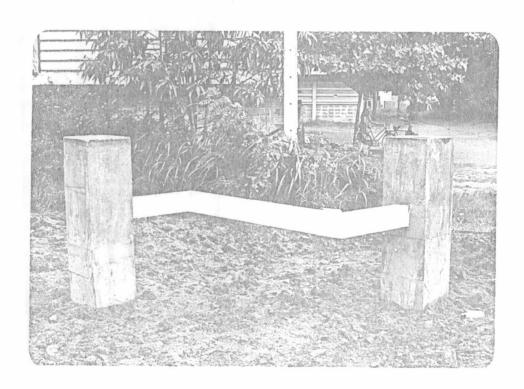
Installation of Reinforcement for S-beam Model.
